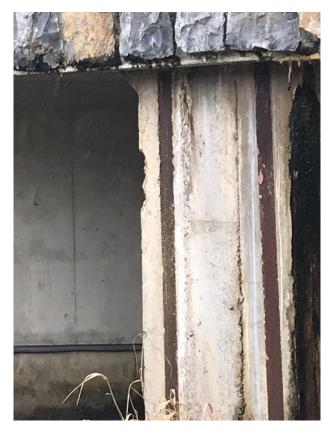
Damage and Concrete Loss to South Pier
